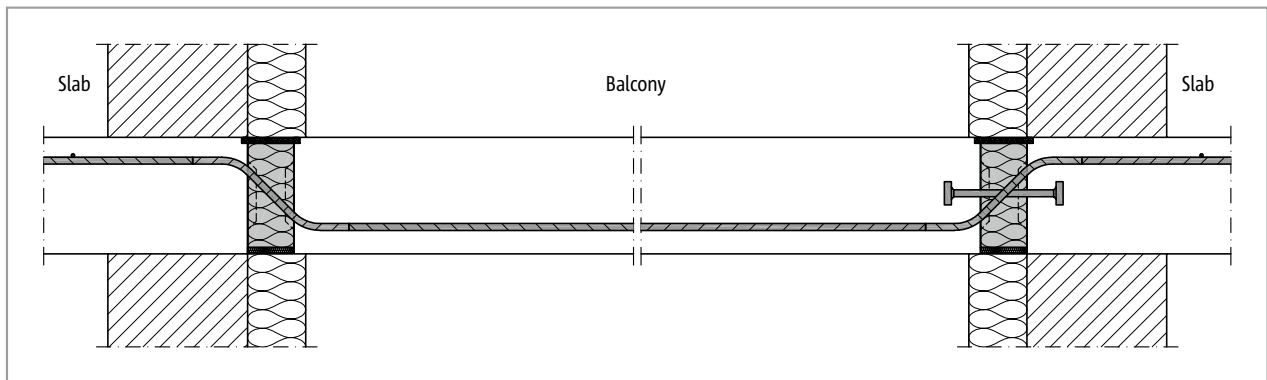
Schöck Isokorb® T type Q-PZ, Q-P: Recessed balcony application see also page 119
